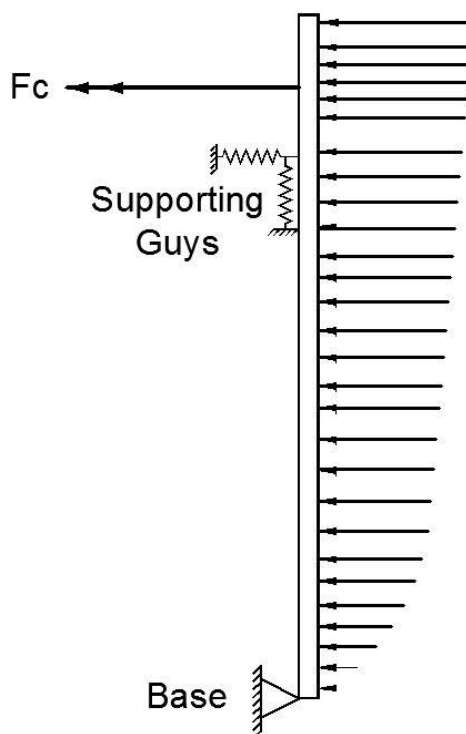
Simulation of the Guyed Tower as an Overhanging Beam
